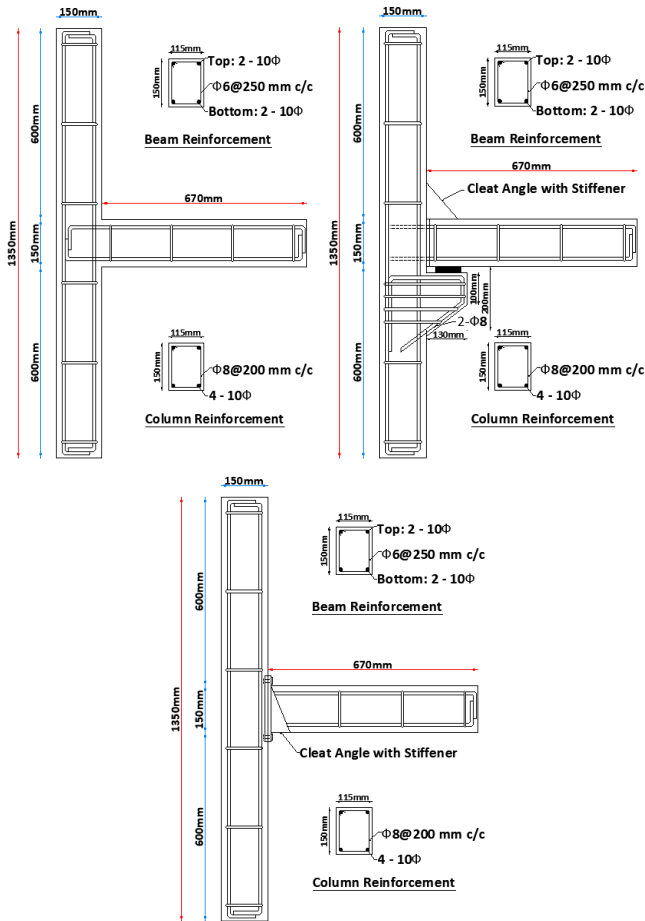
Figure I (a) Monolithic Specimen, (b) Precast Specimen with Corbel Connection, (c) Precast Specimen with Hybrid Connection
